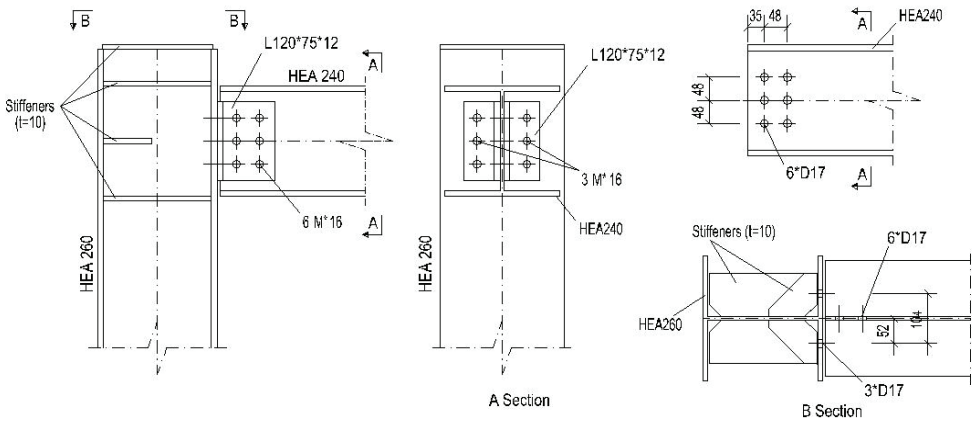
Beam-to-column connection detail of frame (all dimensions are in mm)
